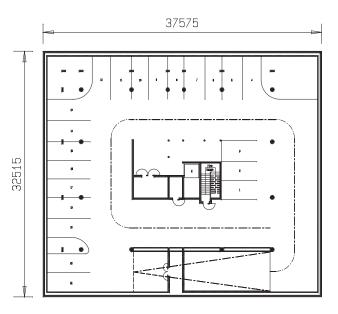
Lower Basement Floor Plan (Scale 1:500)
